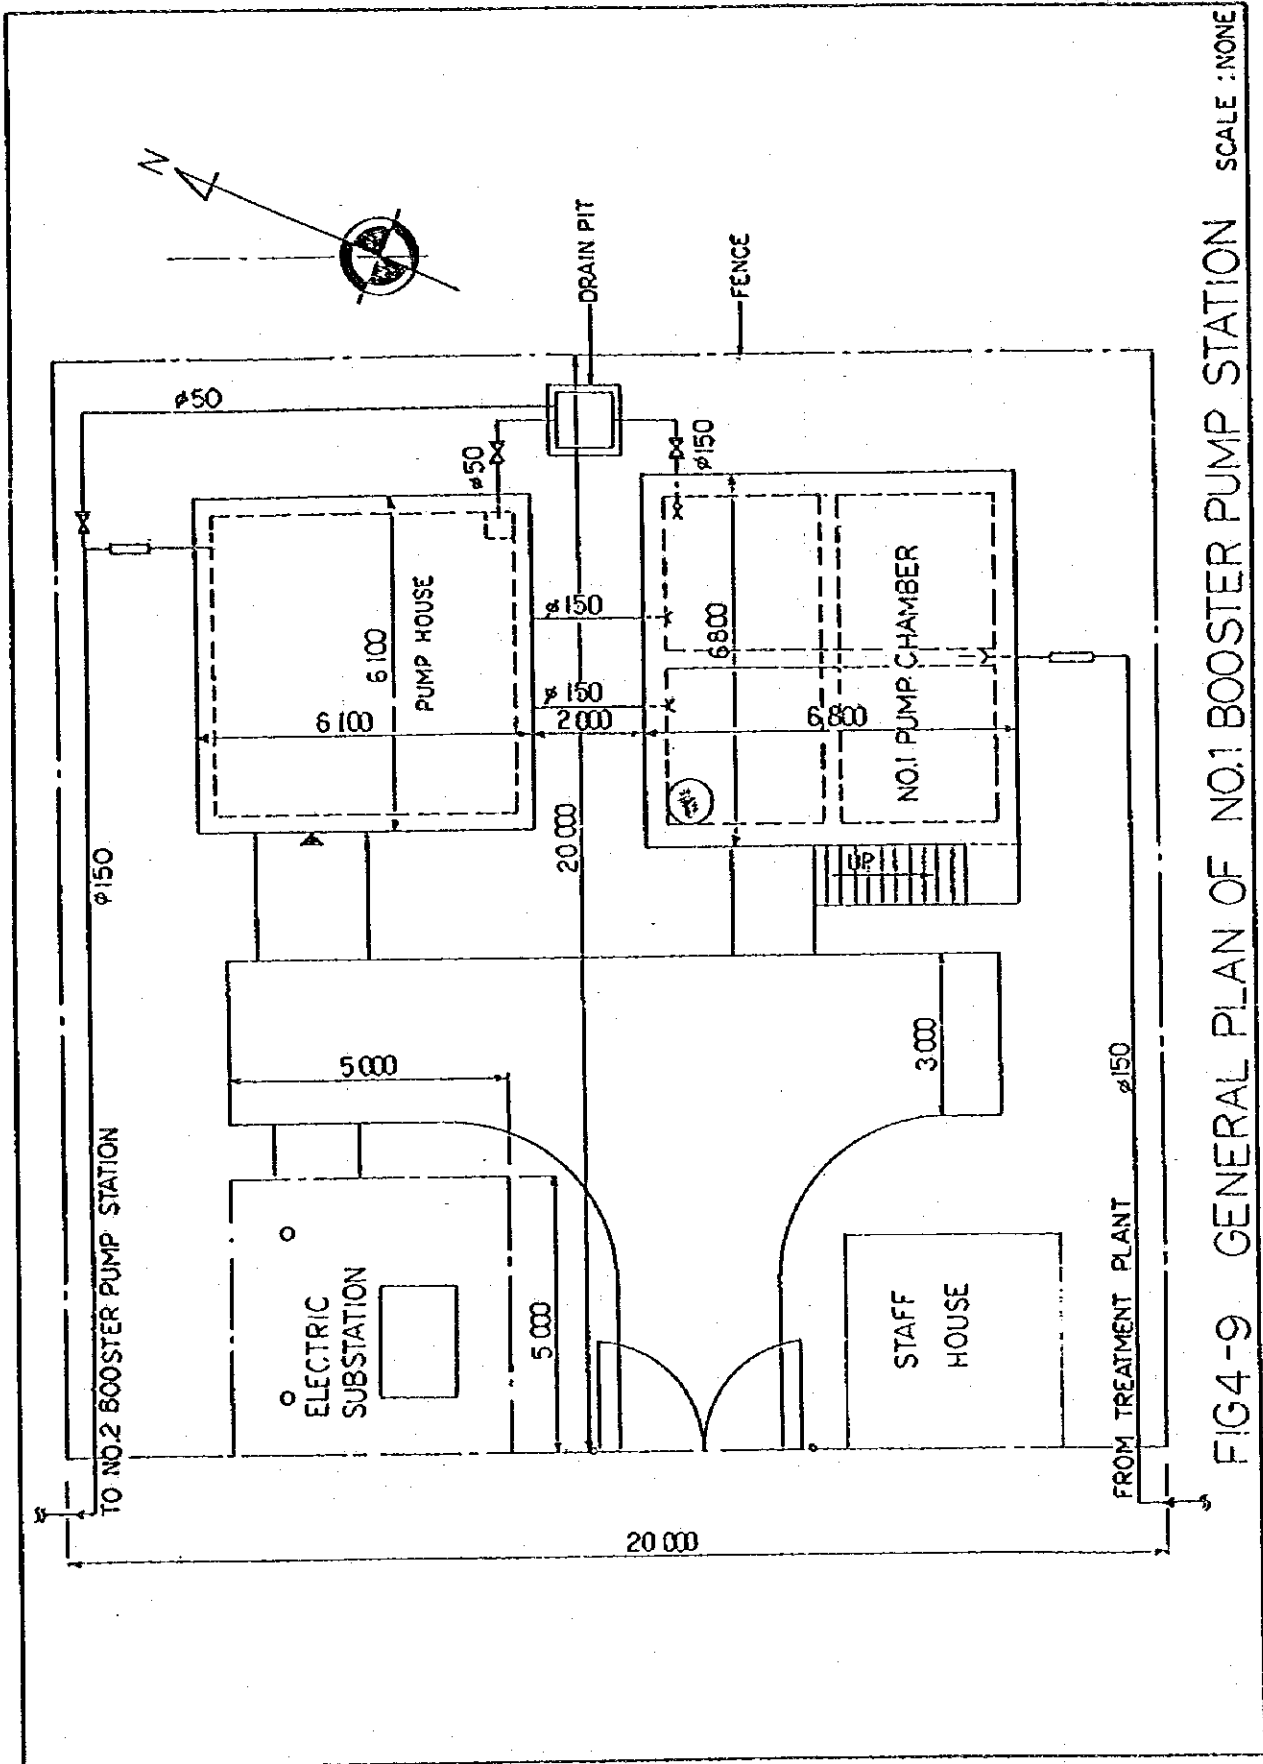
GENERAL PLAN OF NO.1 BOOSTER PUMP STATION SCALE : NONE
